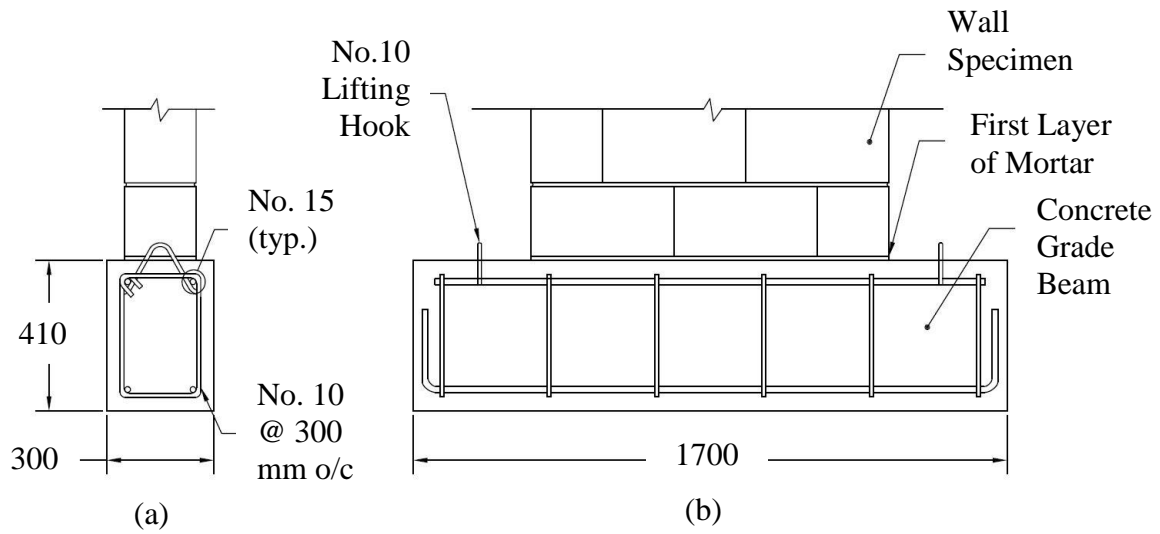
Realistic Bottom Support: (a) Side View, and (b) Front View (after Miranda et al. (2016)) (Dimensions in mm)
